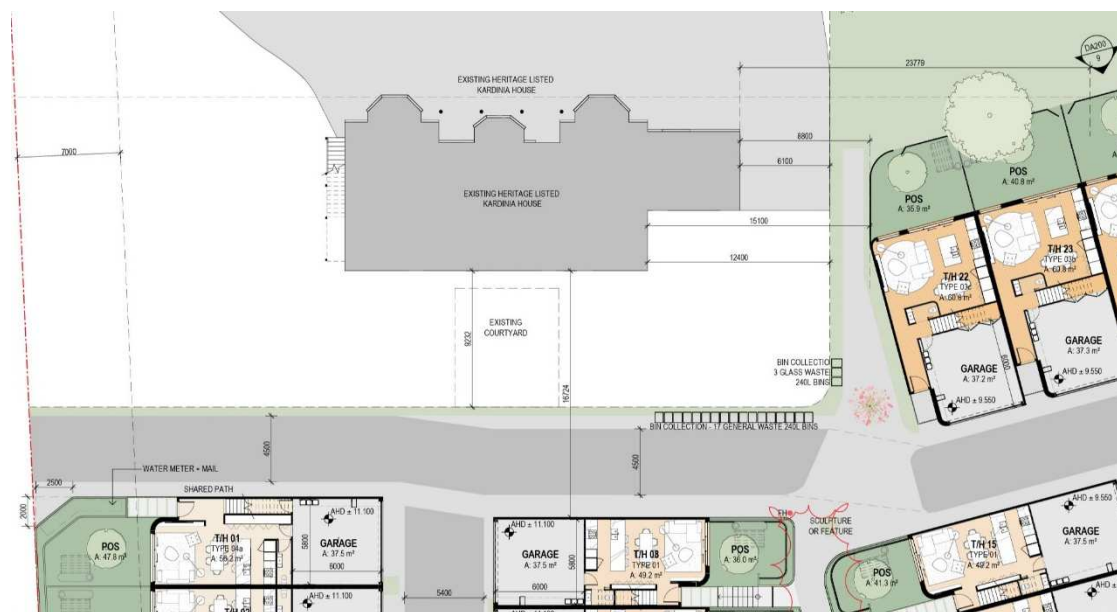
Proposed curtilage details around Kardinia House. Source: Plus Architecture, 2025.
